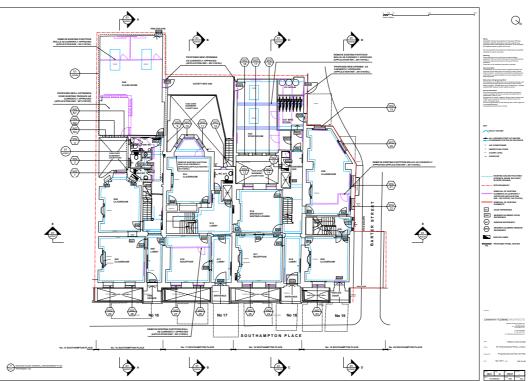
(Above, Left) - Basement Floor Plan, as Currently Approved (Canaway Fleming Architects, 2012).
